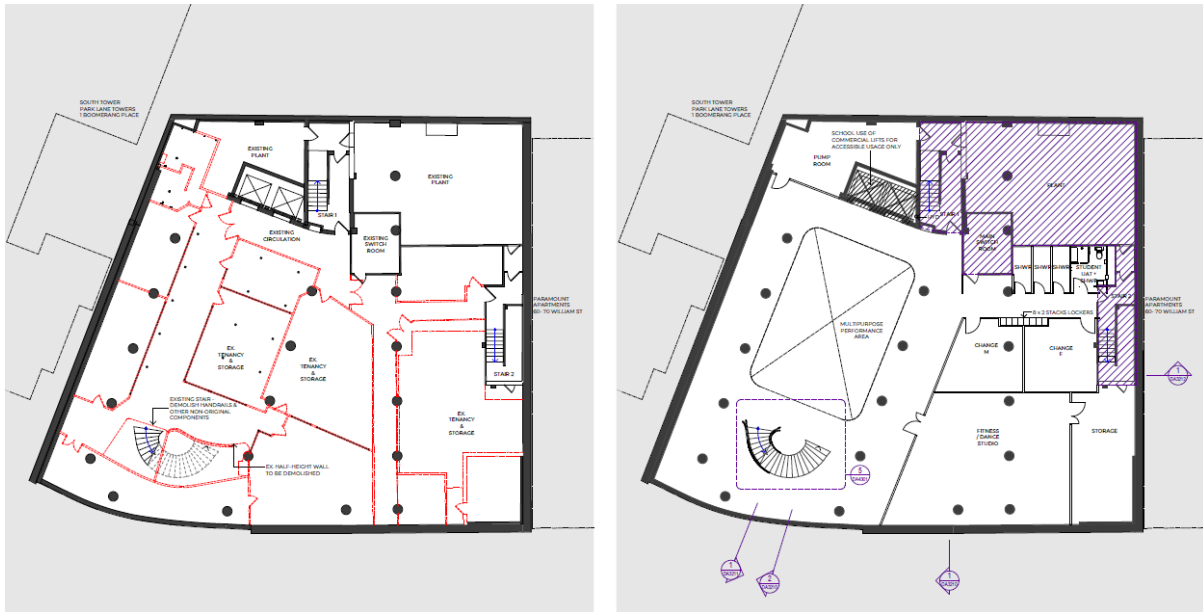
Proposed internal basement demolition (left) and proposed basement floorplan (right)
